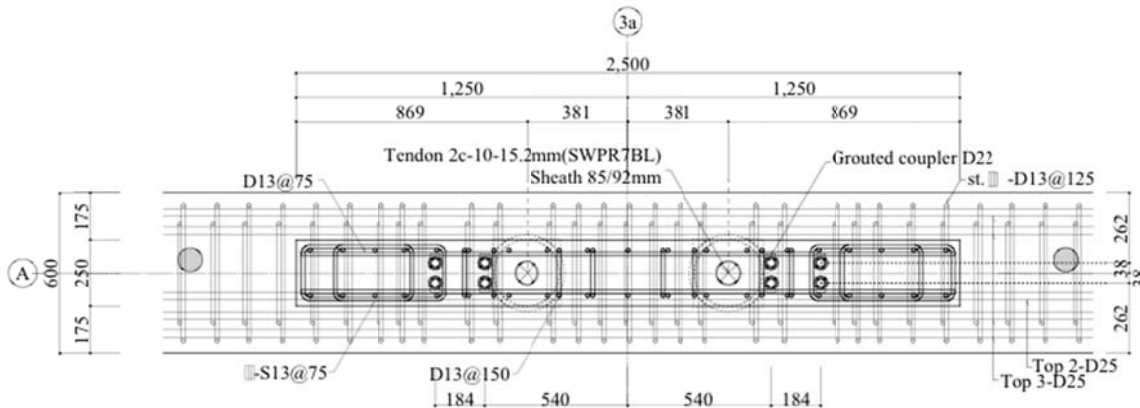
Reinforcement details of wall base (Unit: mm)
